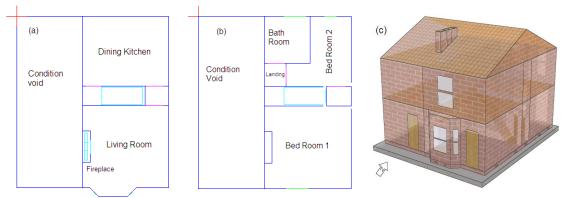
The EH model, (a) ground floor plan, (b) first floor plan, and (c) 3D view
